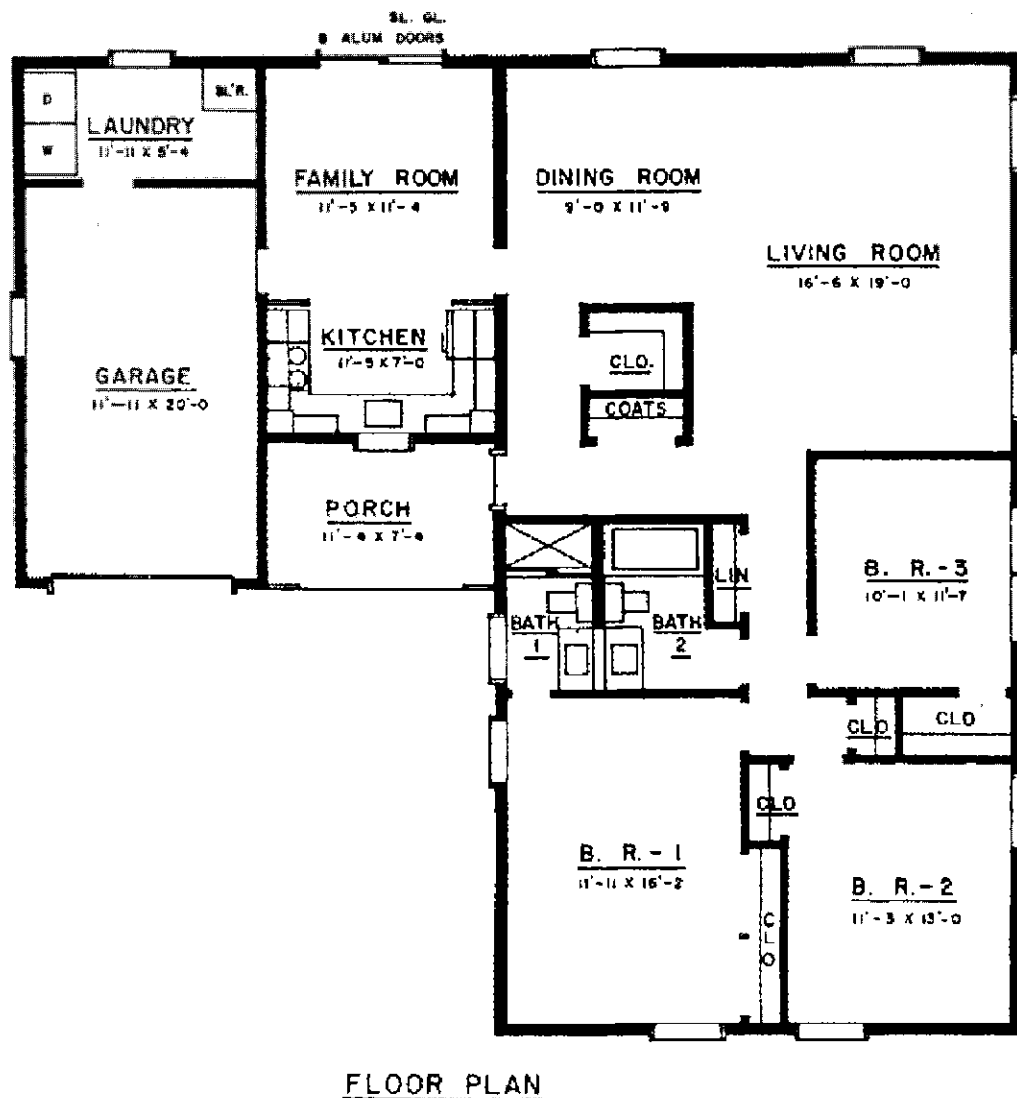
The Rancher model, floor plan, 1964. As completed and initially occupied, the house at 12100 Tulip Grove Drive had this floor plan, except that the garage and laundry room was doubled. Author's collection.
